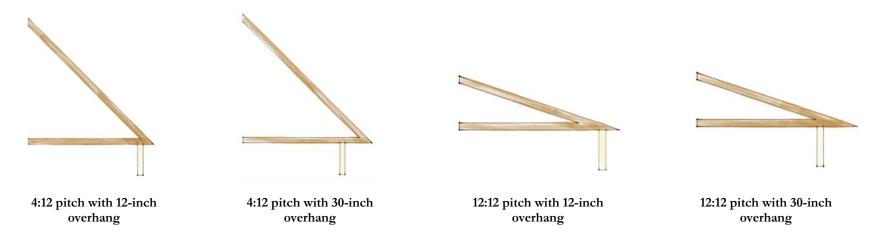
Cross sections of minimum and maximum permitted roof pitches and overhangs. (Source: T&M Associates)
